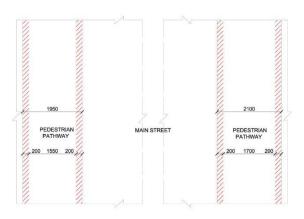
Street width and buffer spaces (in mm) for Gateway 5 in the area surrounding Offenbach am Main Hauptbahnhof
